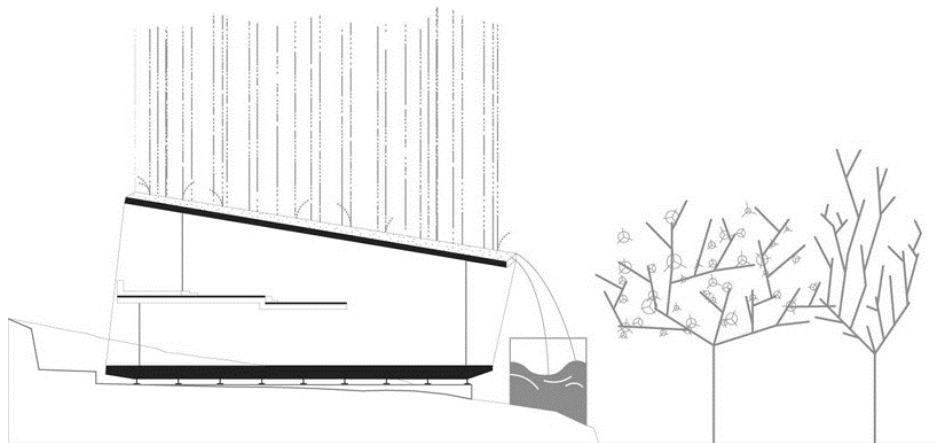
Rainfall harvesting system (adapted from archdaily, 2017)
